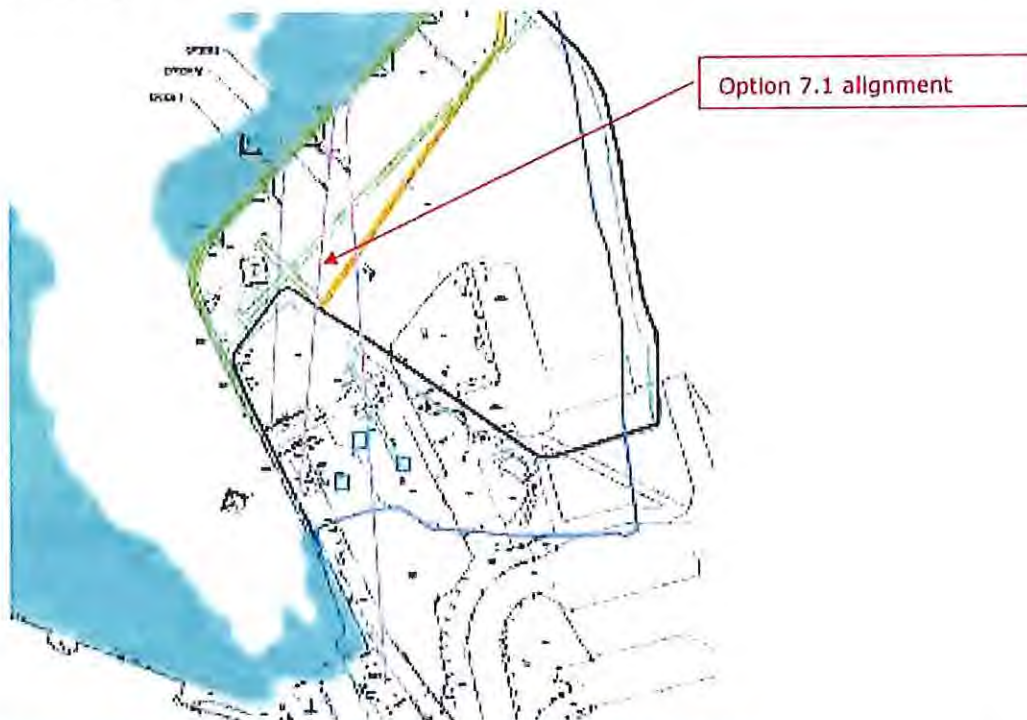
Extract from buried structure plan – refer to Appendix 2 for full detail
